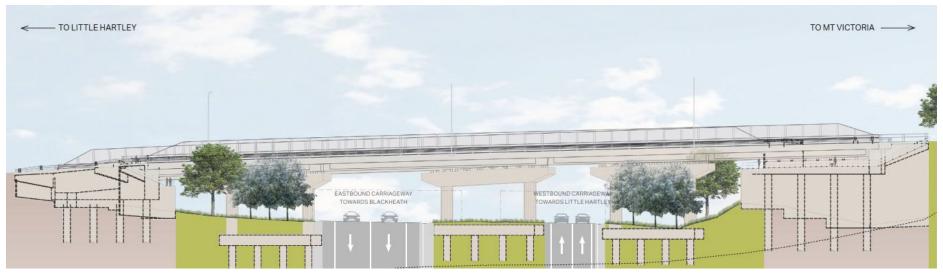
Typical long section of the new bridge forming part of the eastbound off-ramp connection
